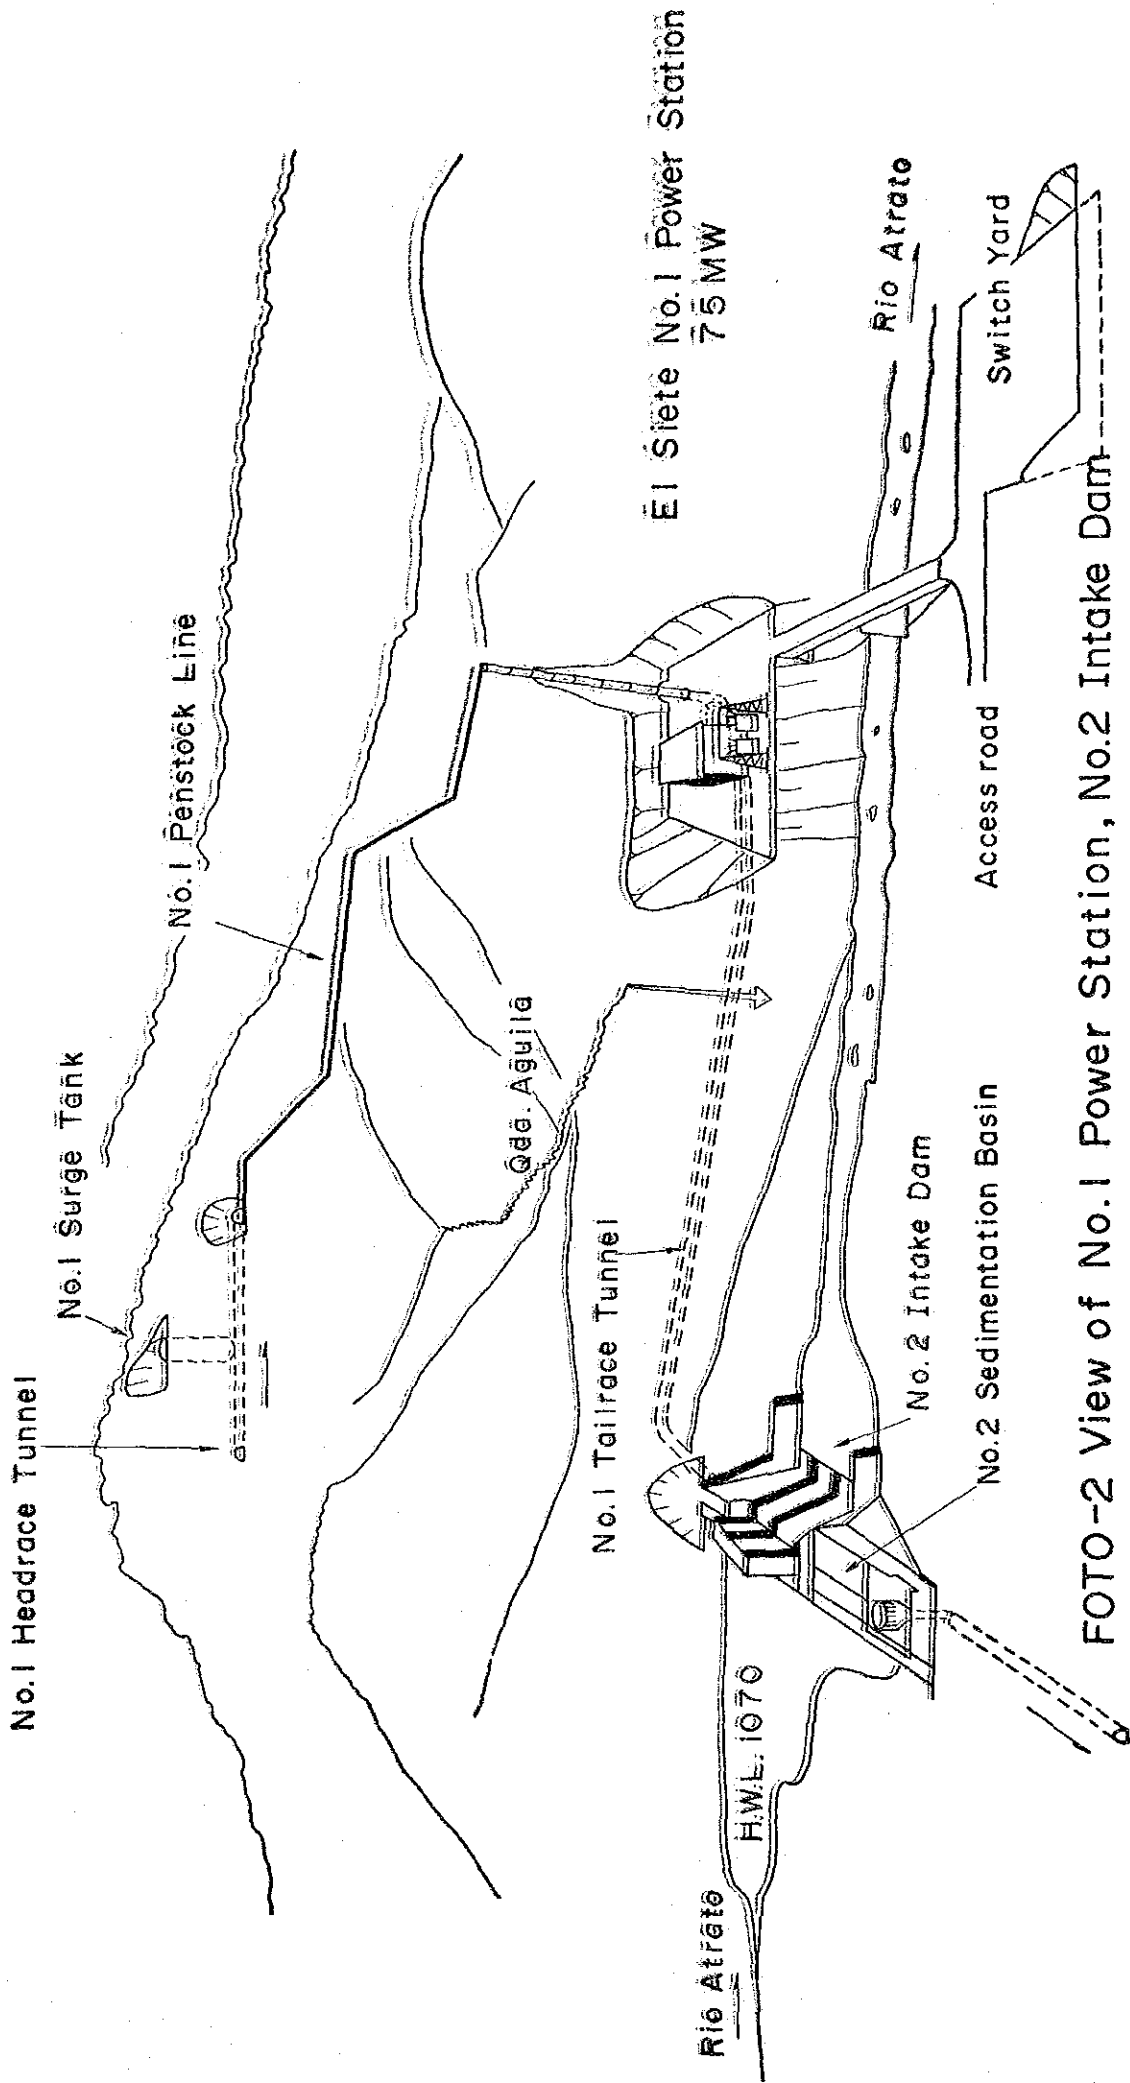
View of No.1 Power Station, No.2 Intake Dam
